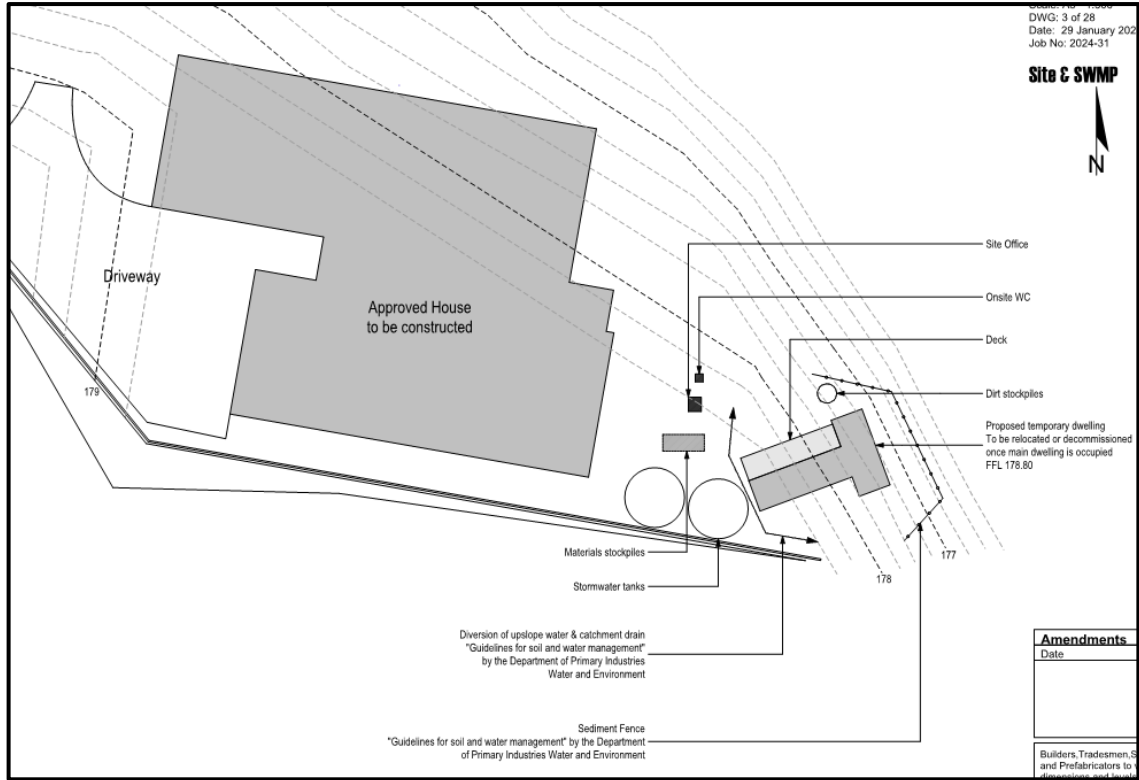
Site plan showing approved dwelling and proposed temporary dwelling.
